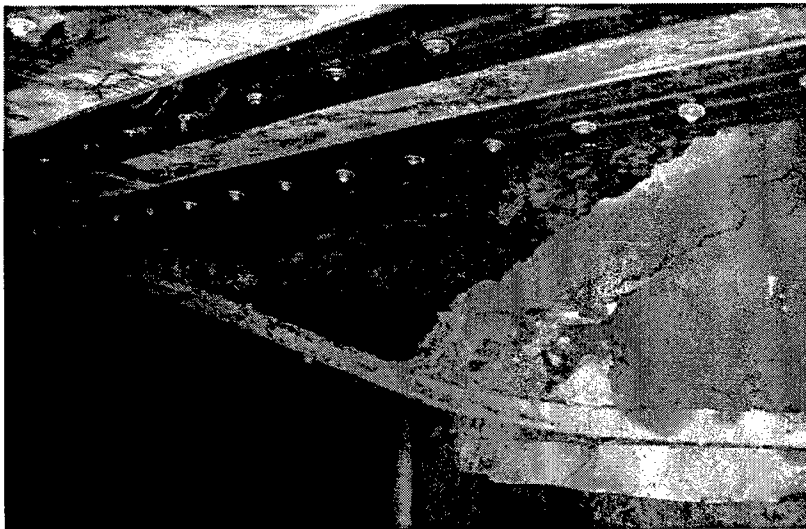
Shear failure and spalling along southeast portion of west section
